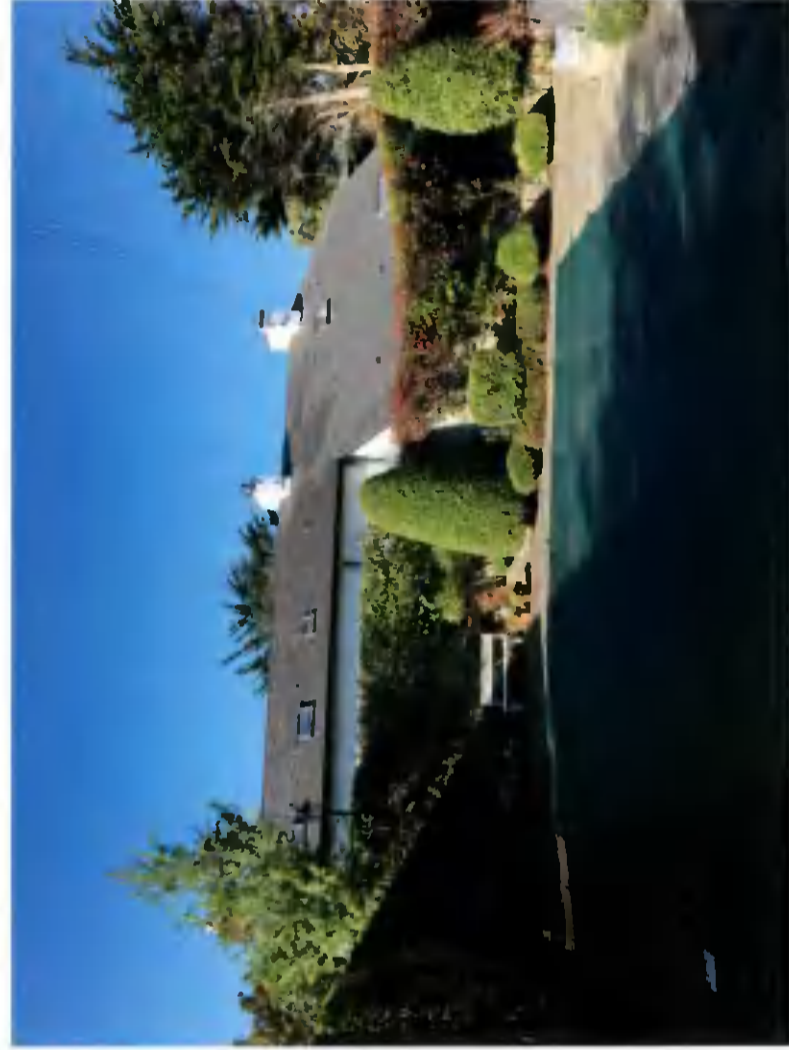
Outbuildings converted to dwelling resulting in subdivision of the property.
